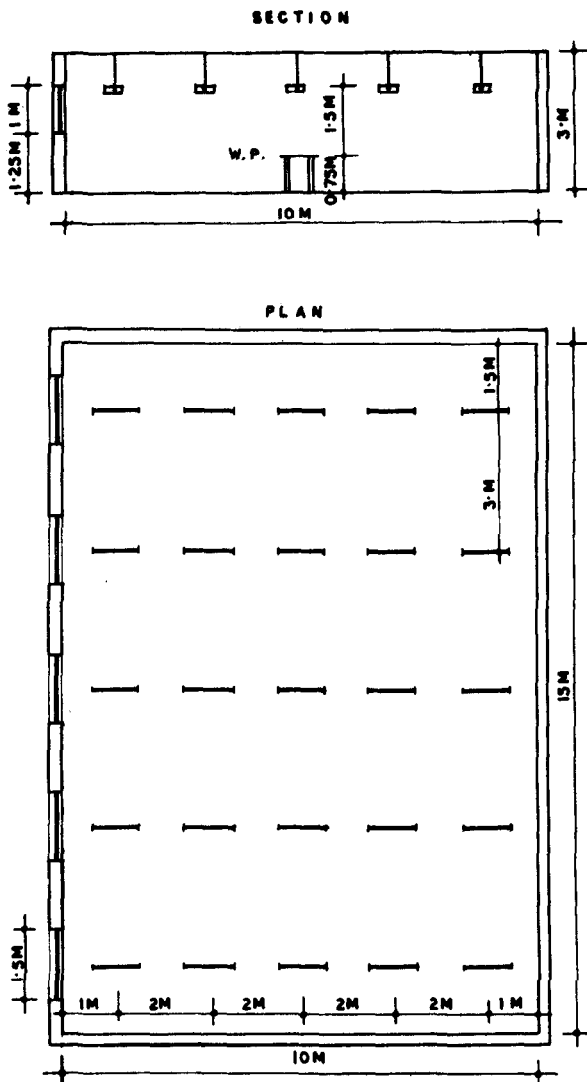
DISTRIBUTION OF SINGLE LAMP LUMINAIRES ON SECTION AND PLAN (EXAMPLE 27)
